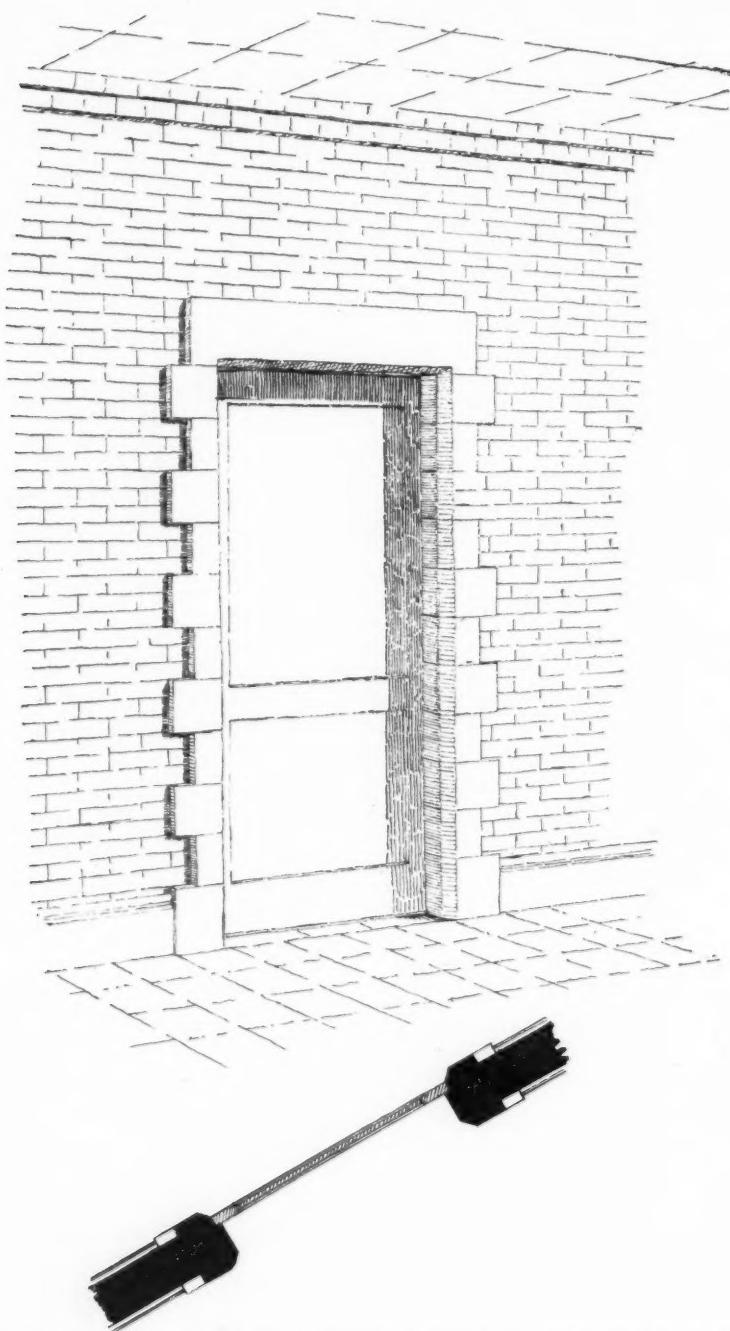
Door Casing of Cut Stone, Projecting Beyond the Brick Enough to Serve as Ground for Plastering.
